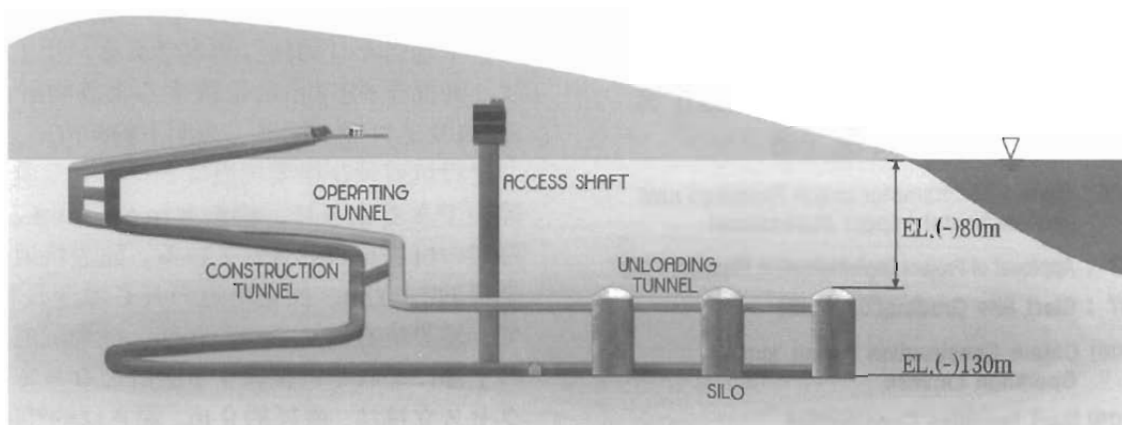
Vertical View of Design Layout of LILW Disposal Facility at First Phase
